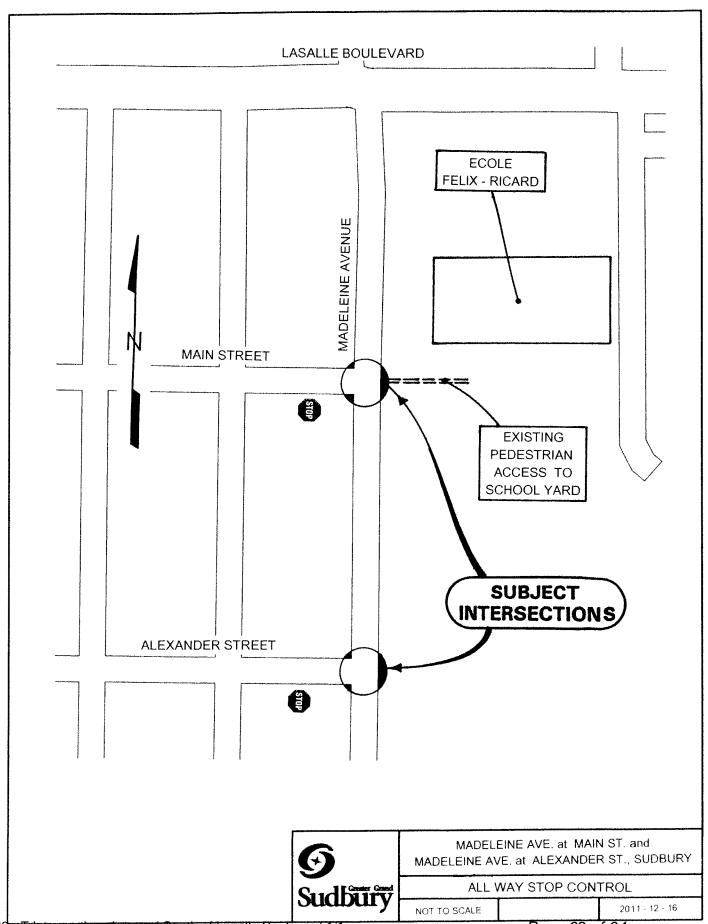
T Intersections Located South of Lasalle Boulevard 1/1
